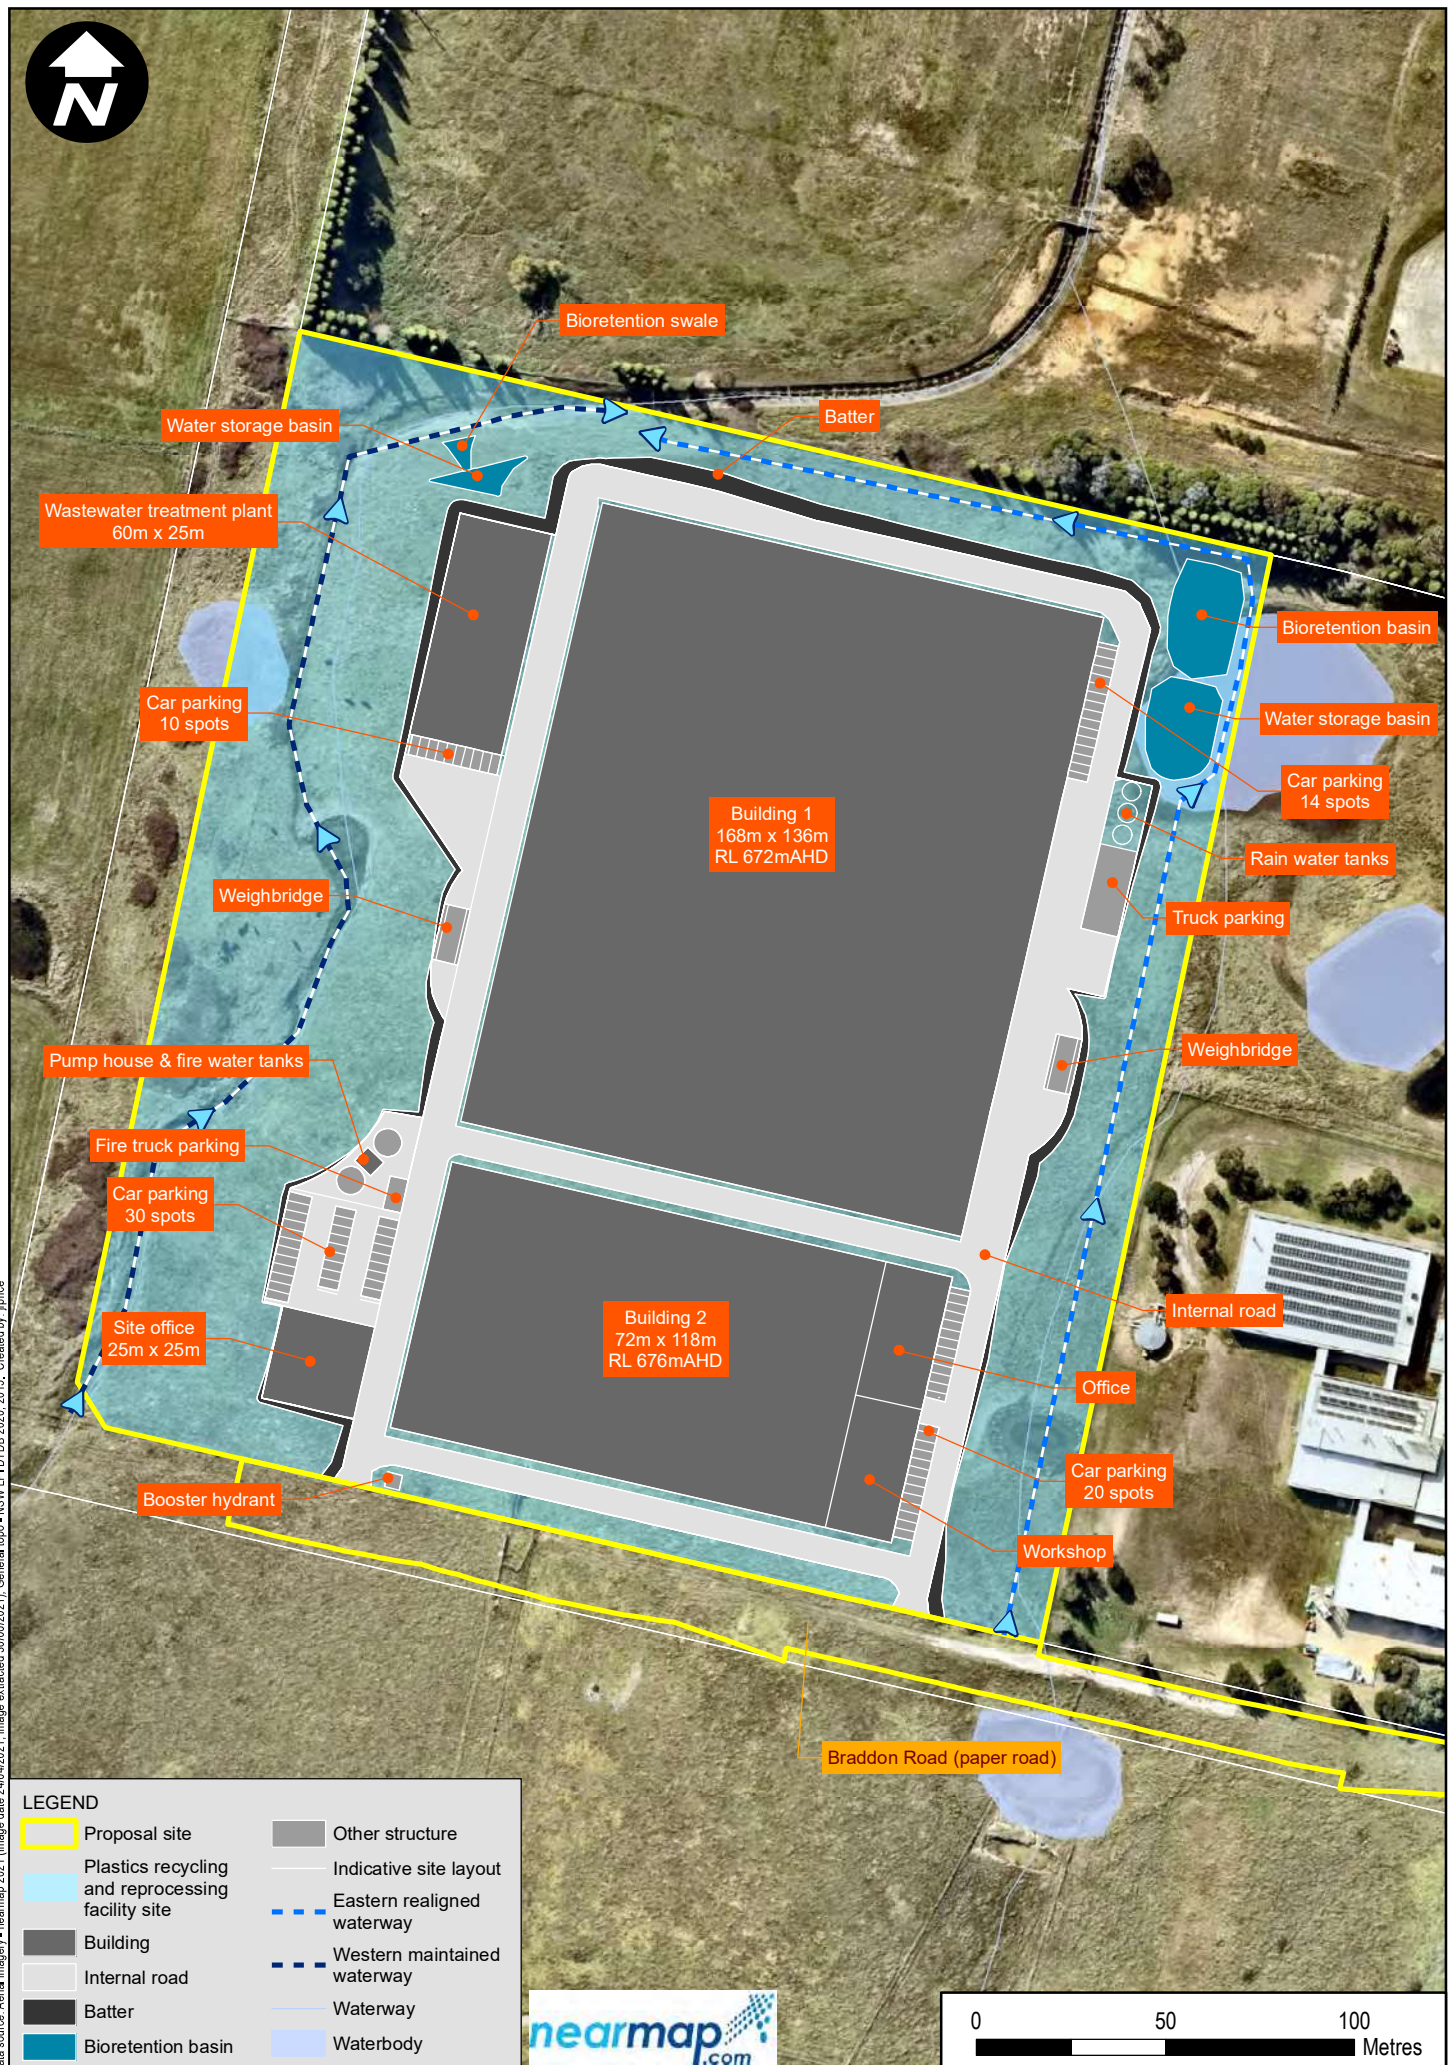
Concept plastics recycling and reprocessing facility layout
